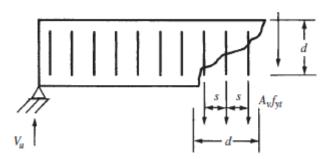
Beam with diagonal cracks and vertical stirrups
